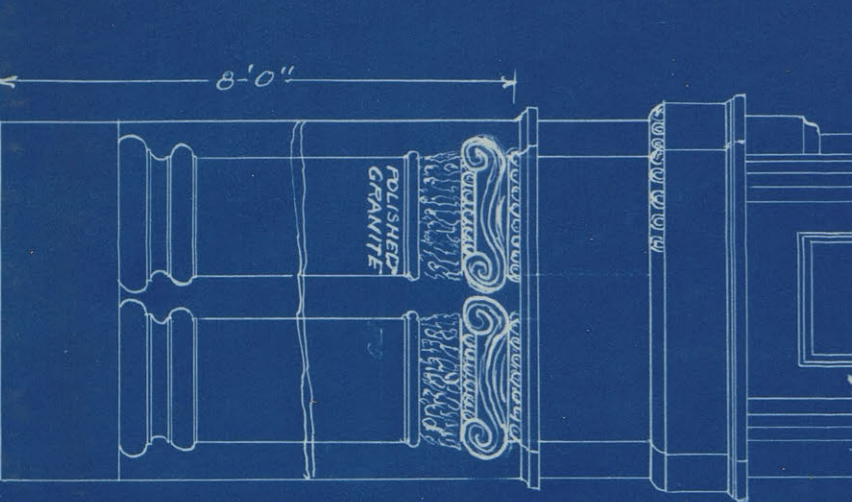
DETAIL OF GIRDER IN FIRST FLOOR LOBBY
